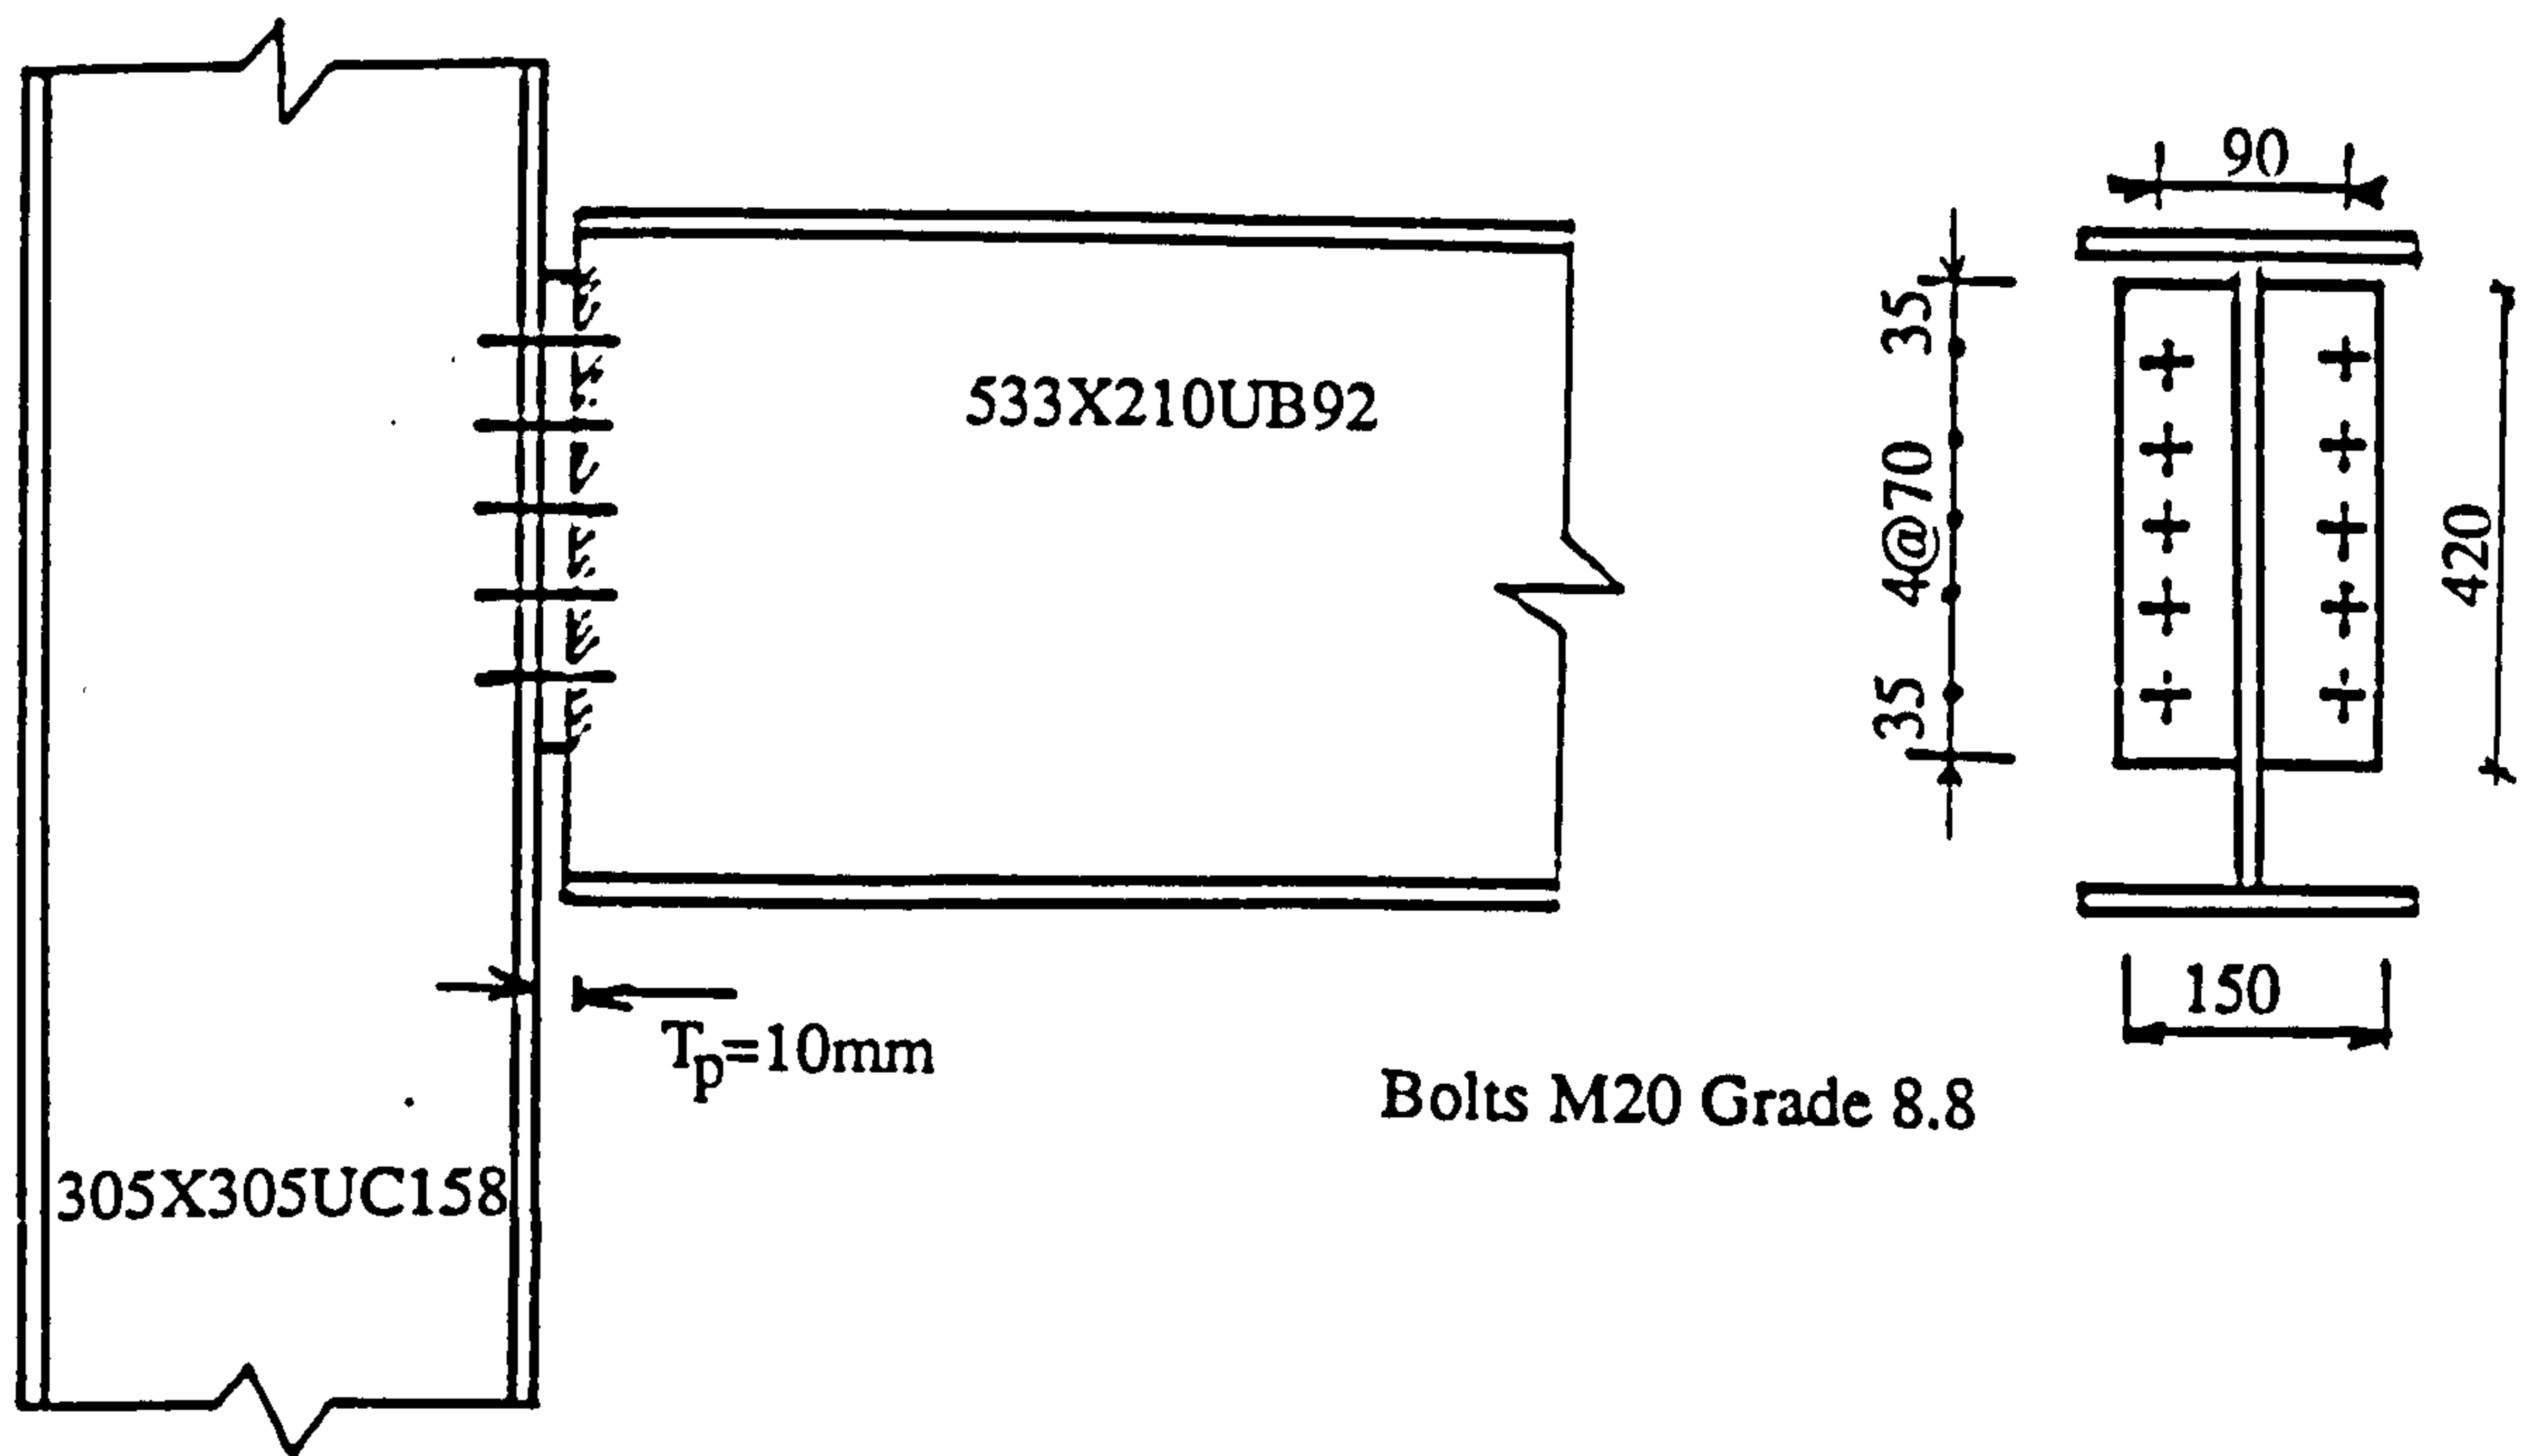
Connection details used in sub-frames SA1 and SB1.
